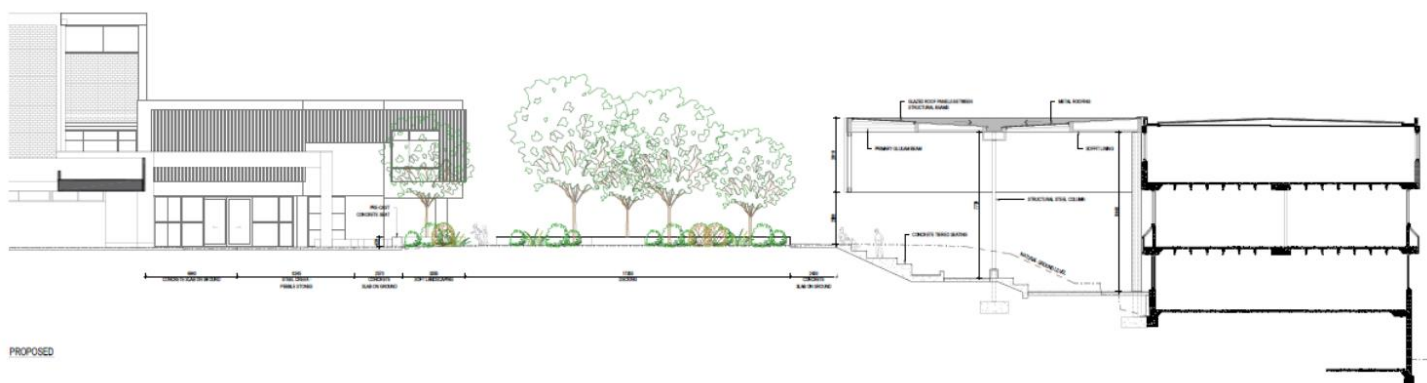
North south section of proposal (Margaret Carey Building to the right)
